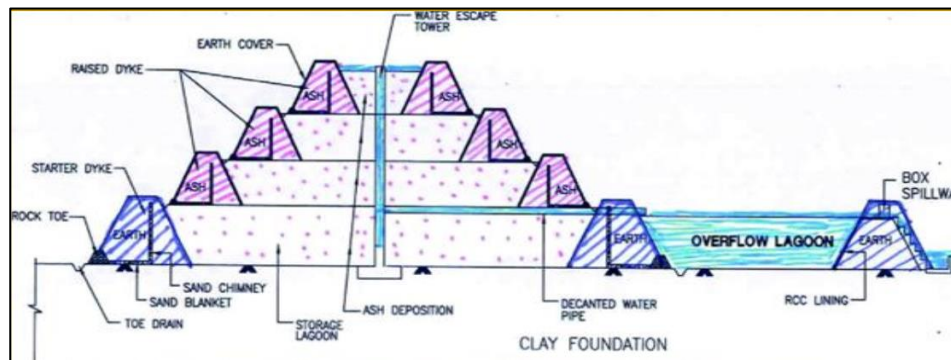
TYPICAL SECTION OF STORAGE LAGOON AND OFL
